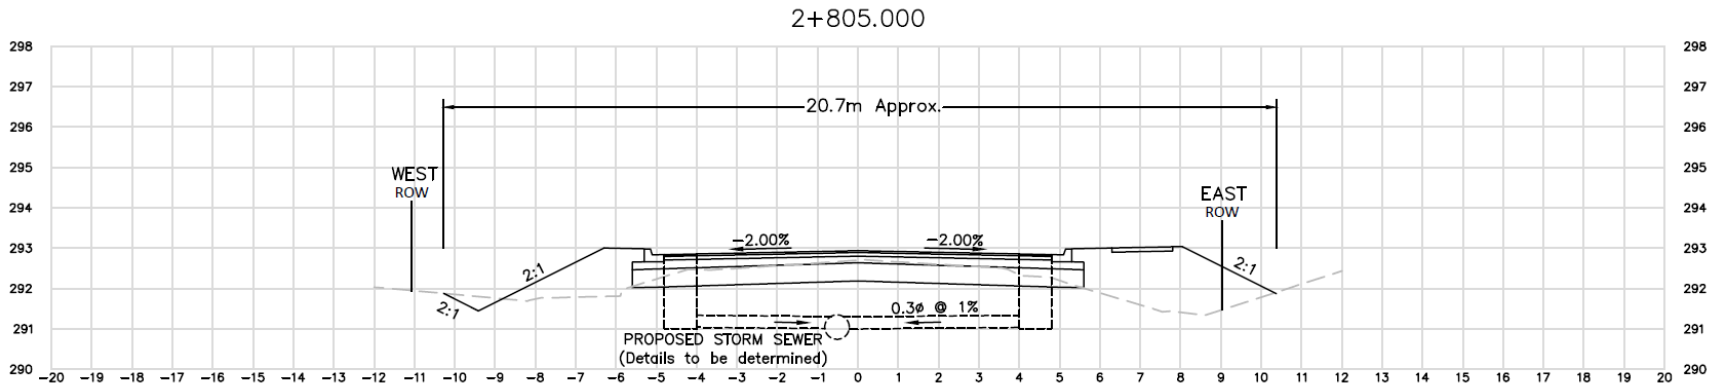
Option 4. Urban Section with Retaining Wall, V-Ditch & Storm Sewer
